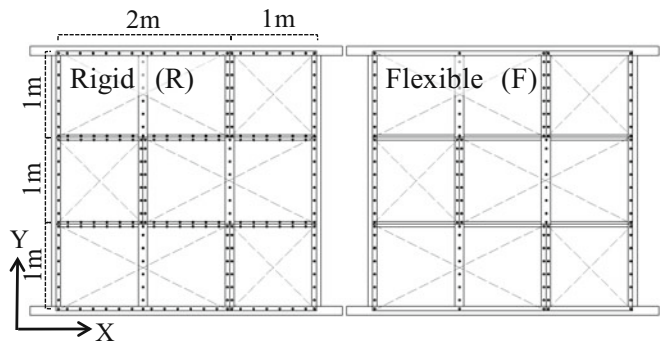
Frame and nail patterns for rigid (R) and flexible (F) diaphragms. In rigid diaphragms, sheets are nailed on beams, joists, and bridging joists; in flexible diaphragms, sheets are not nailed on beams or bridging joists
